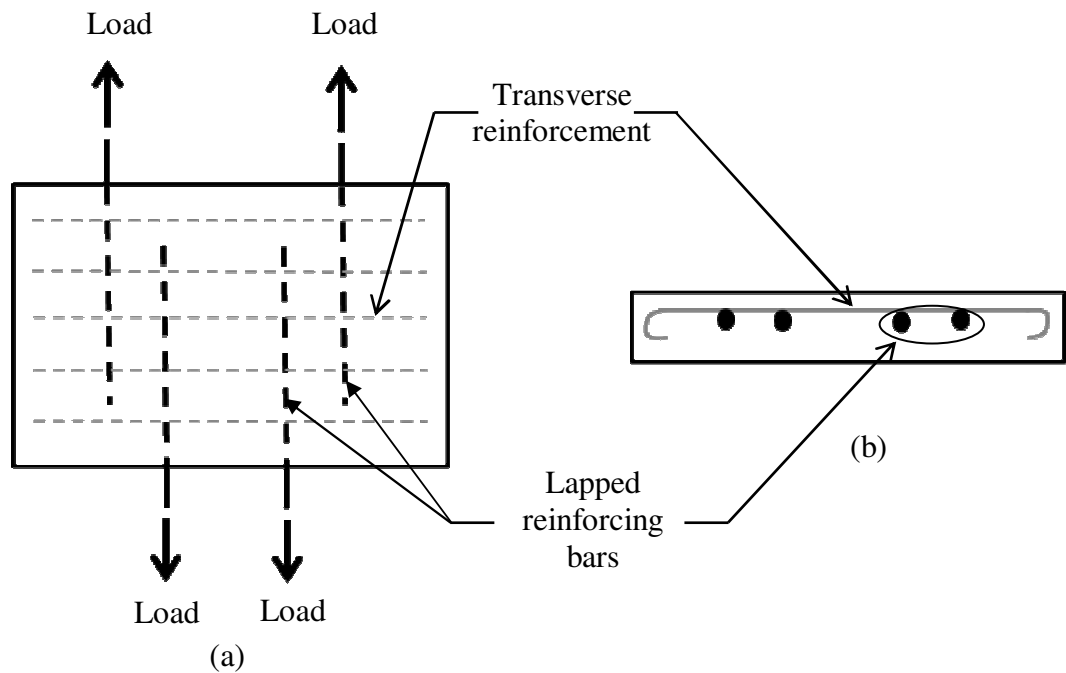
Full-scale wall plate tests by Sagan et al. (1991): (a) elevation, and (b) cross-section. (Sagan et al., 1991).
